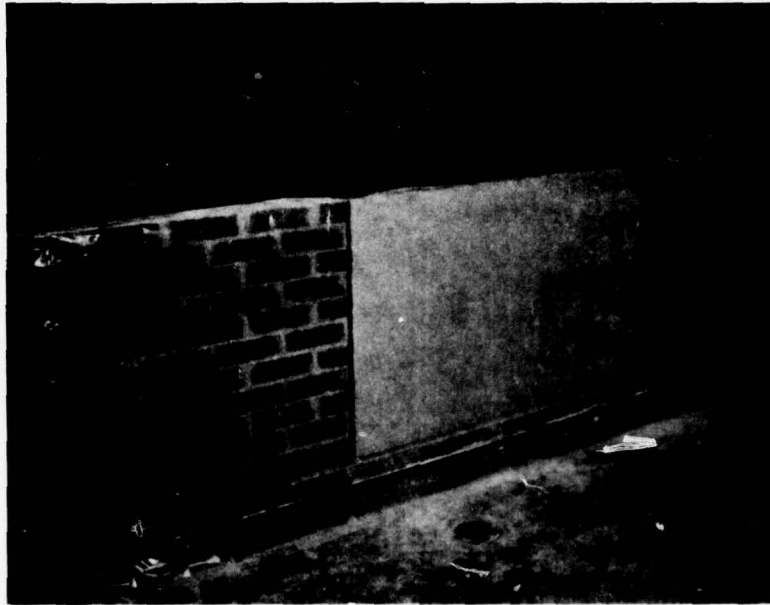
Footing, tubular seal, and plastic waterproofing barrier
